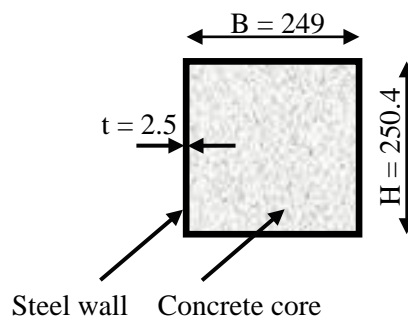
Cross-section of unstiffened CFSC stub column, (unit: mm)
